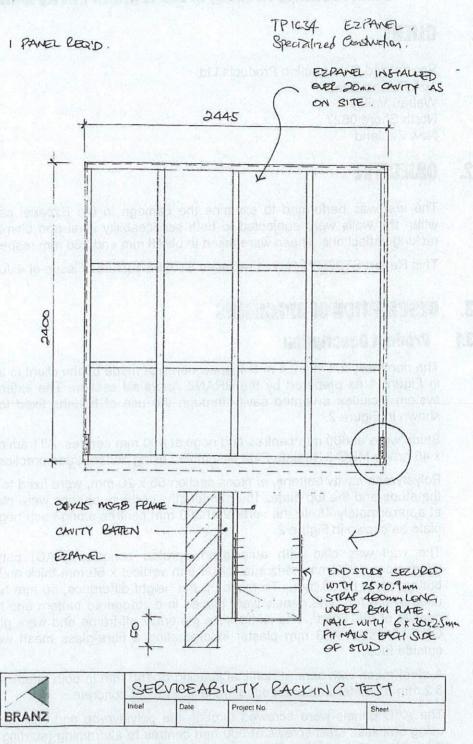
BRANZ Appraisal supplied drawing of wall construction
